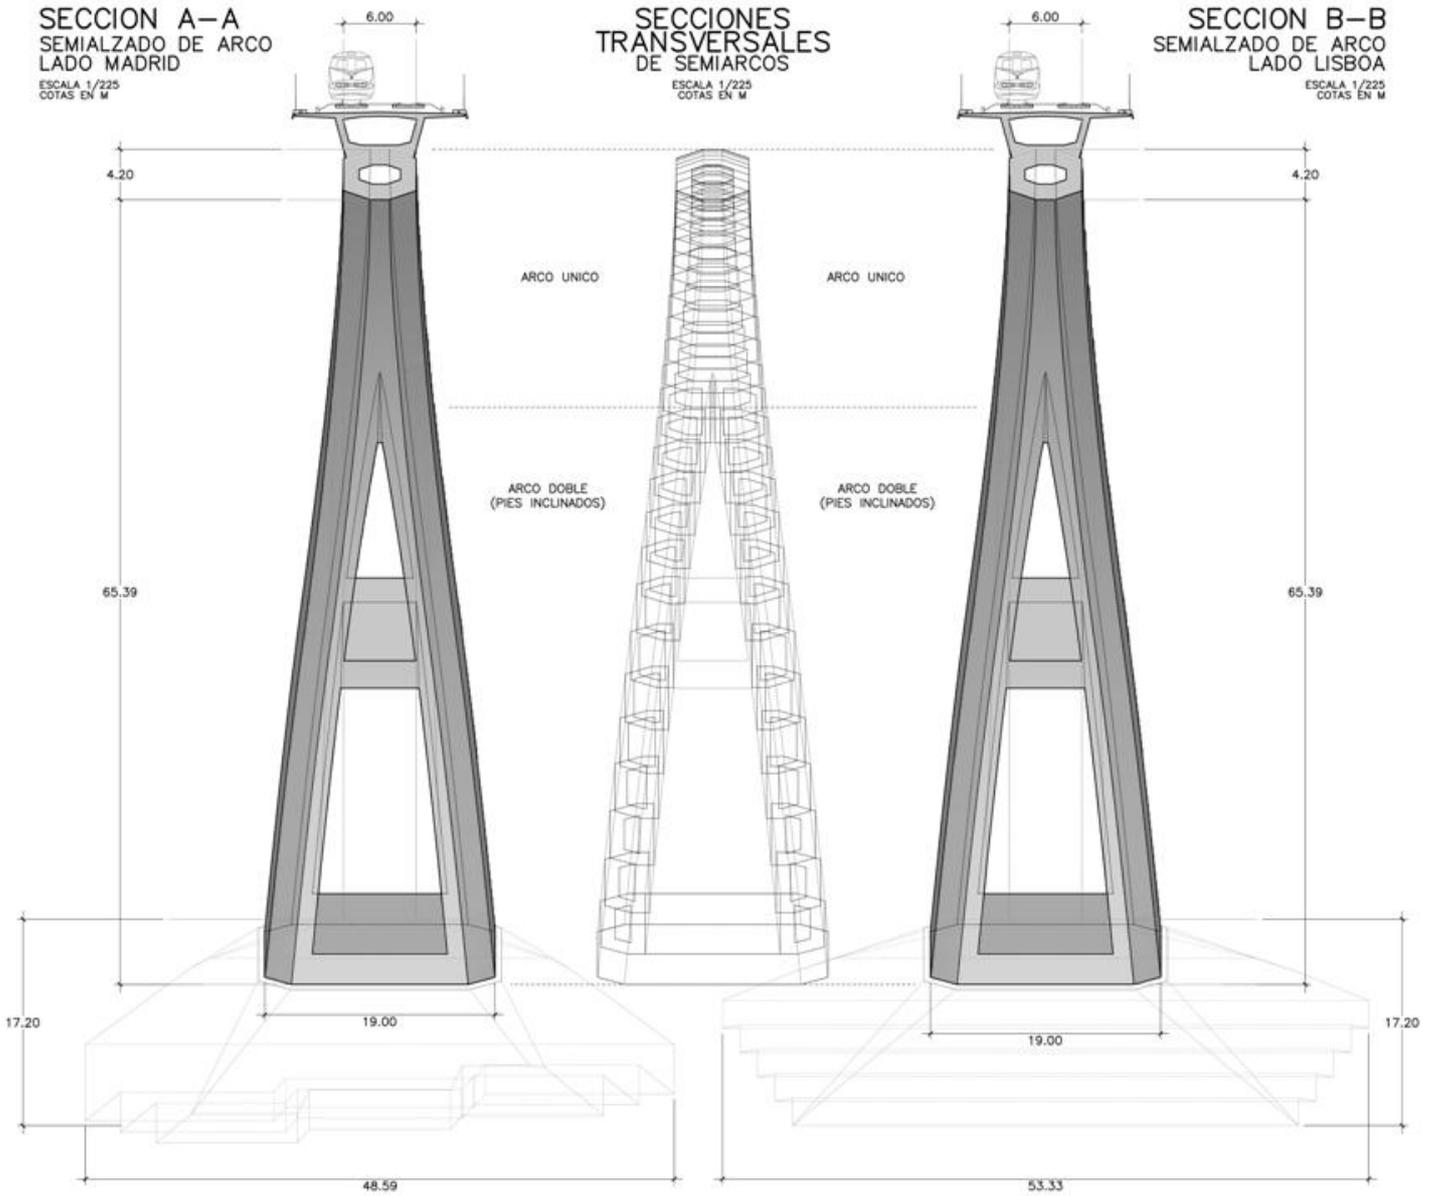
Geometric definition of the arch 02. Side elevations and cross sections
